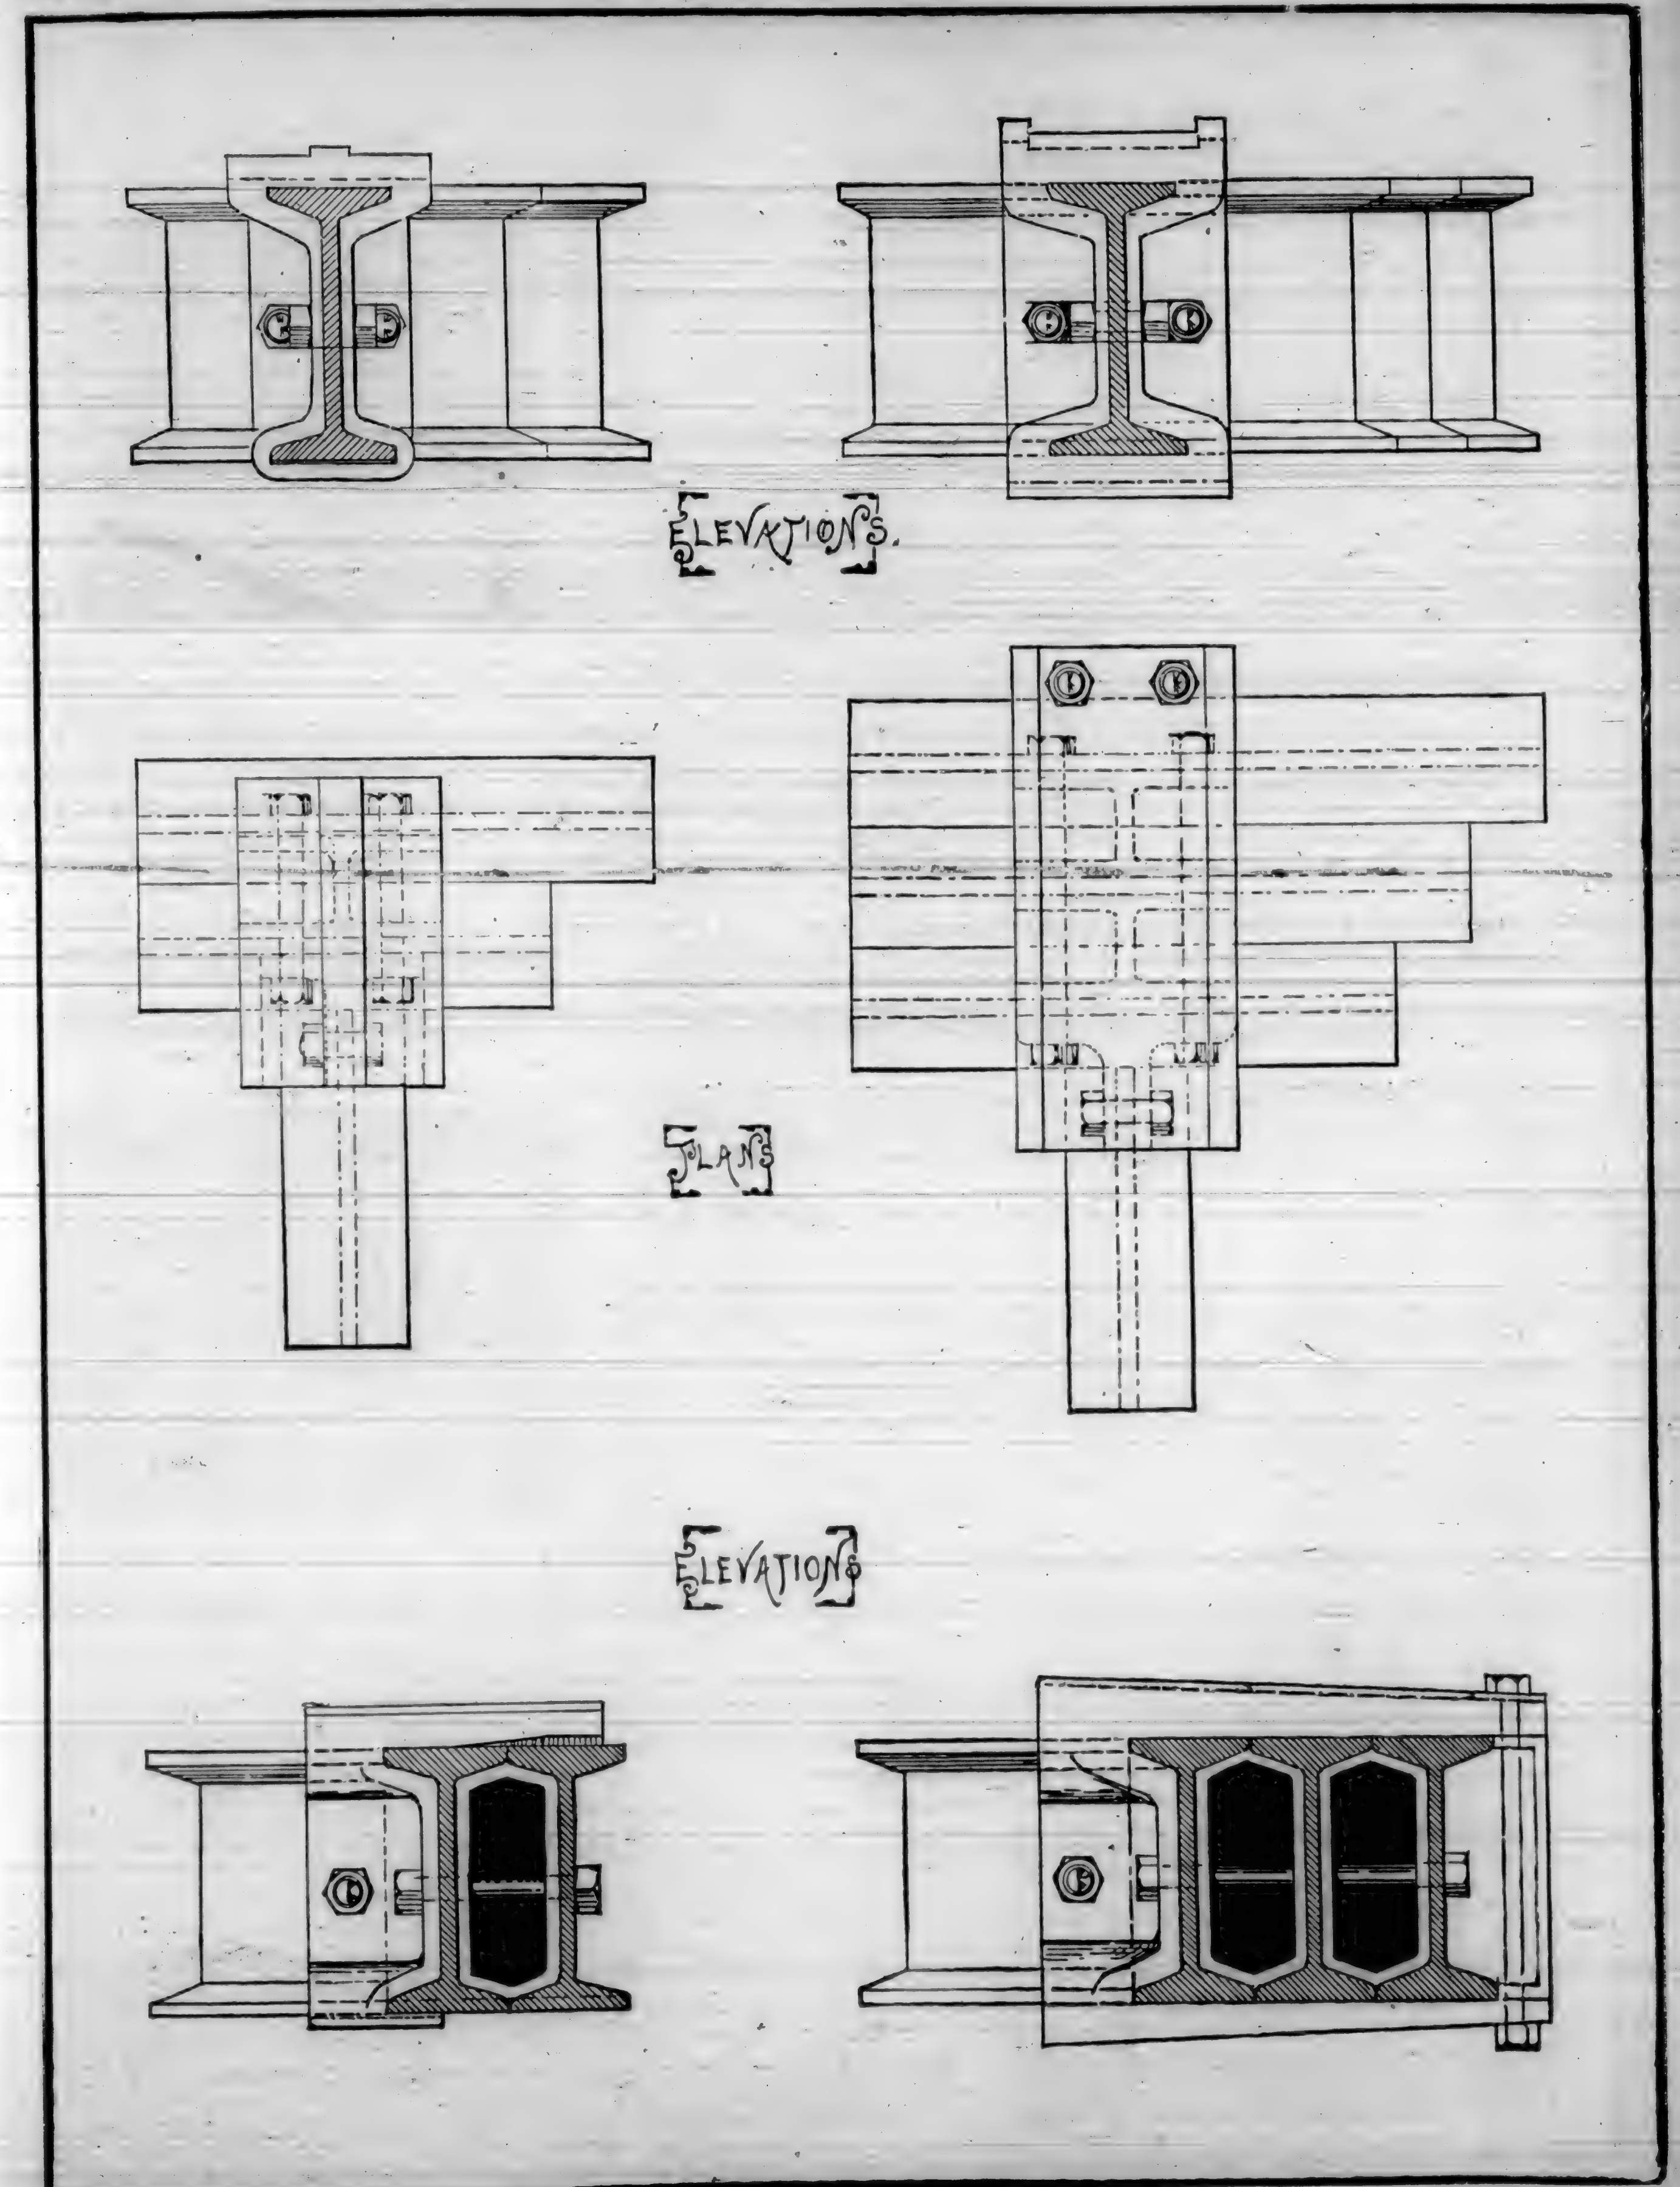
CONSTRUCTION OF GIRDERS. (See Page 50.)
